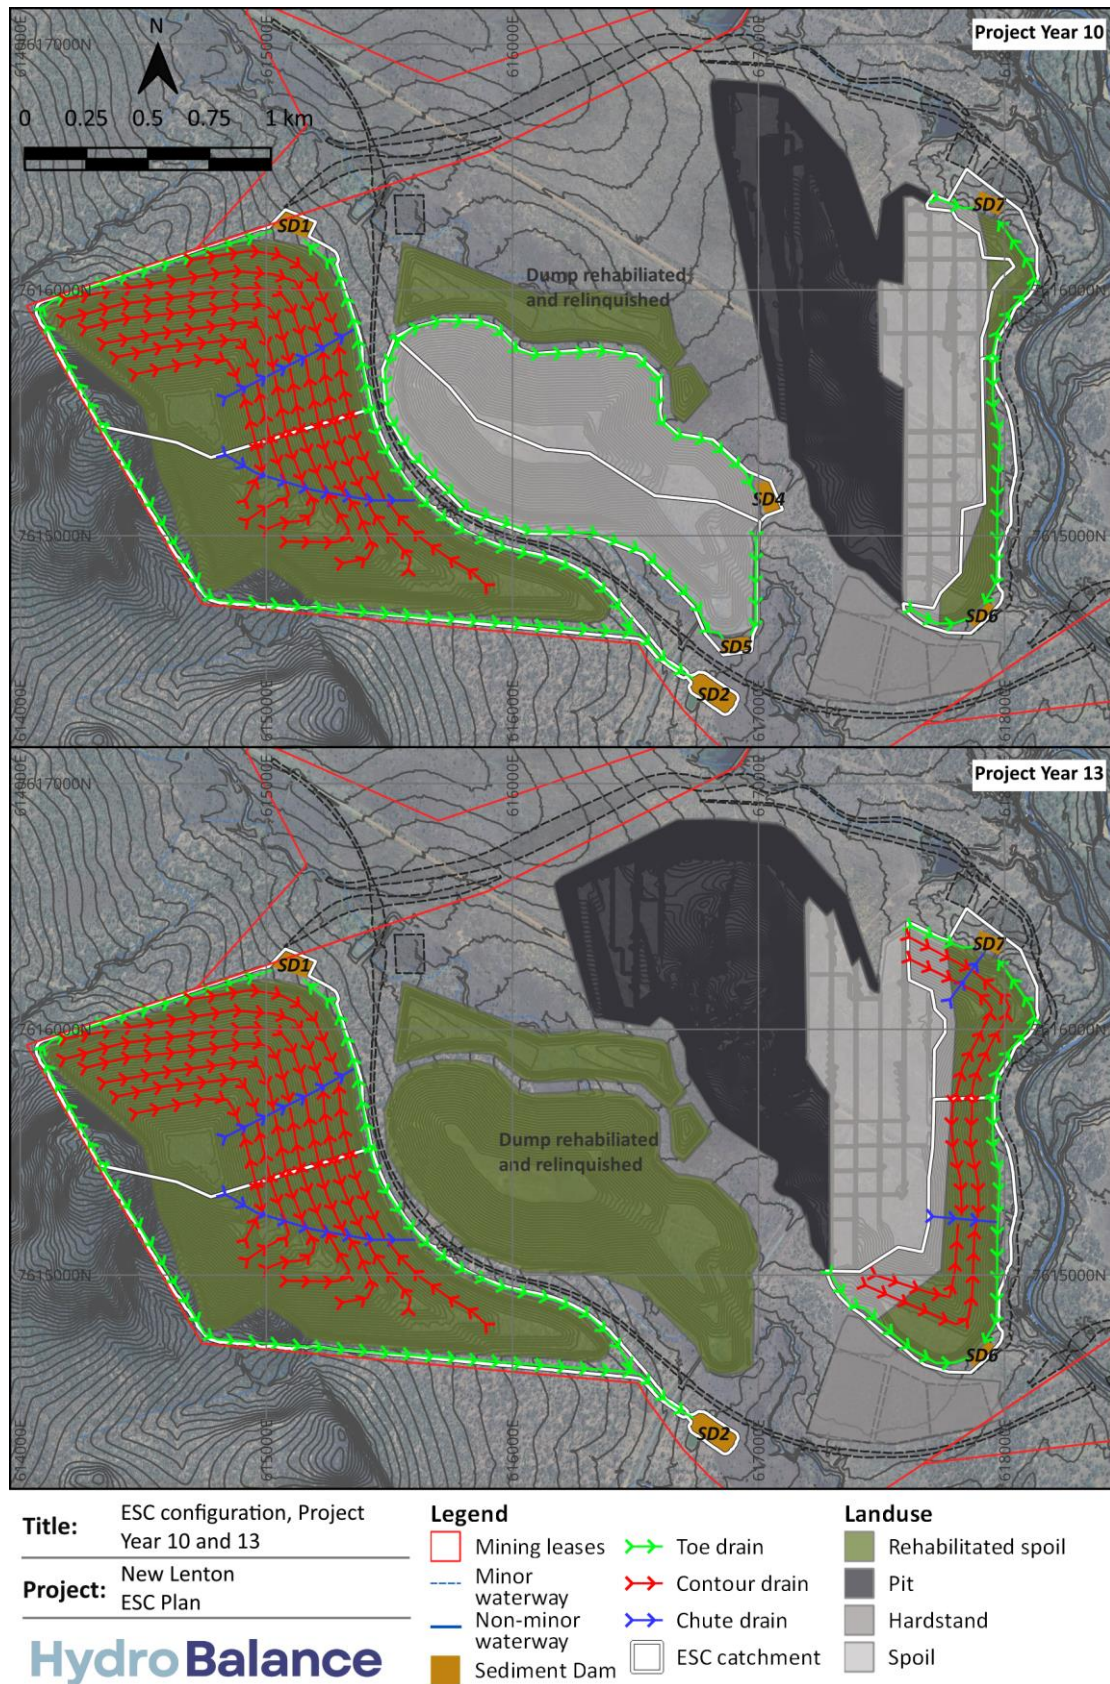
Locality plan – sediment dams and drains, Project Year 10 and 13
